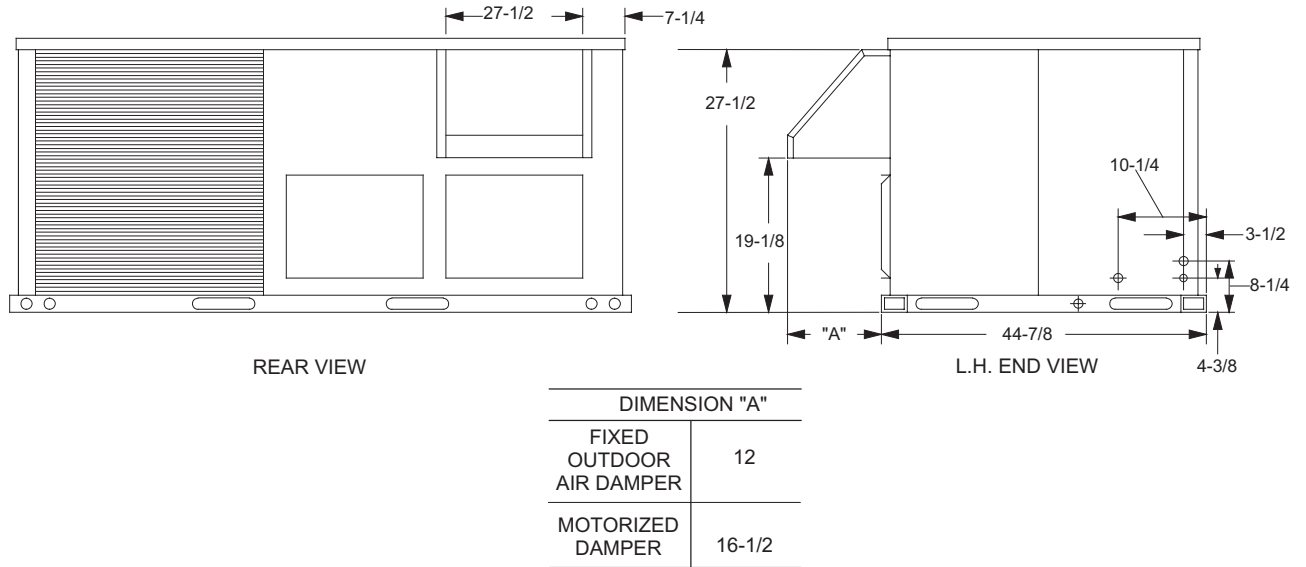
DETAIL B UNIT DIMENSIONS WITH DAMPER/RAINHOOD
